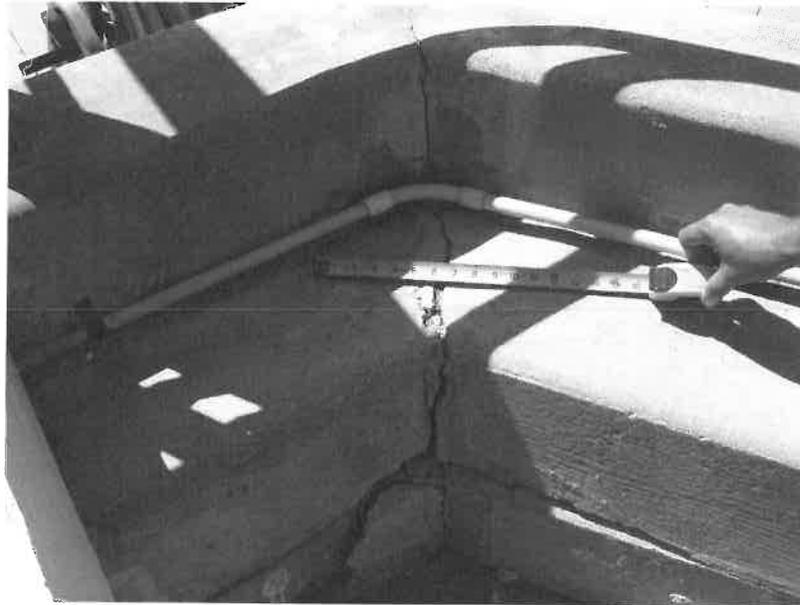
33, Naples, Top Deck Survey: Corso Di Napoli, #5705
